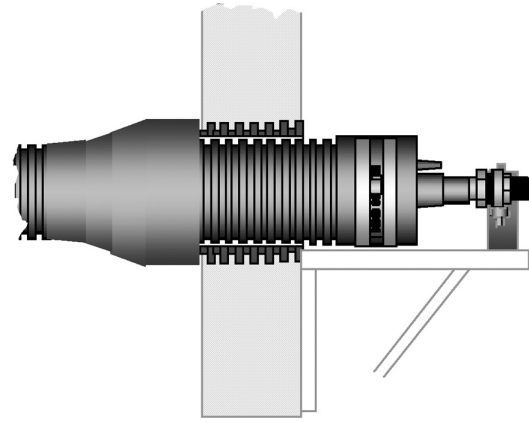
Routing pipe through the Wall Sleeve with Heat Shrink Seal Kit
